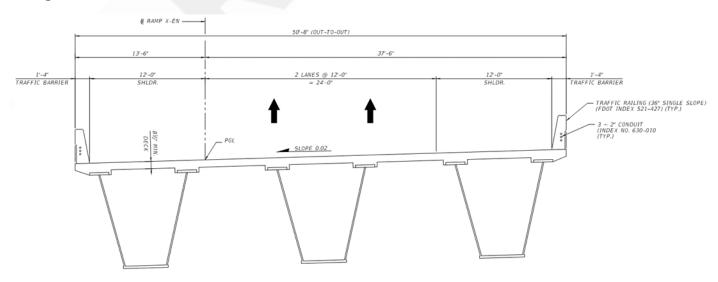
Bridge Typical Section (Bridge No. 9)
